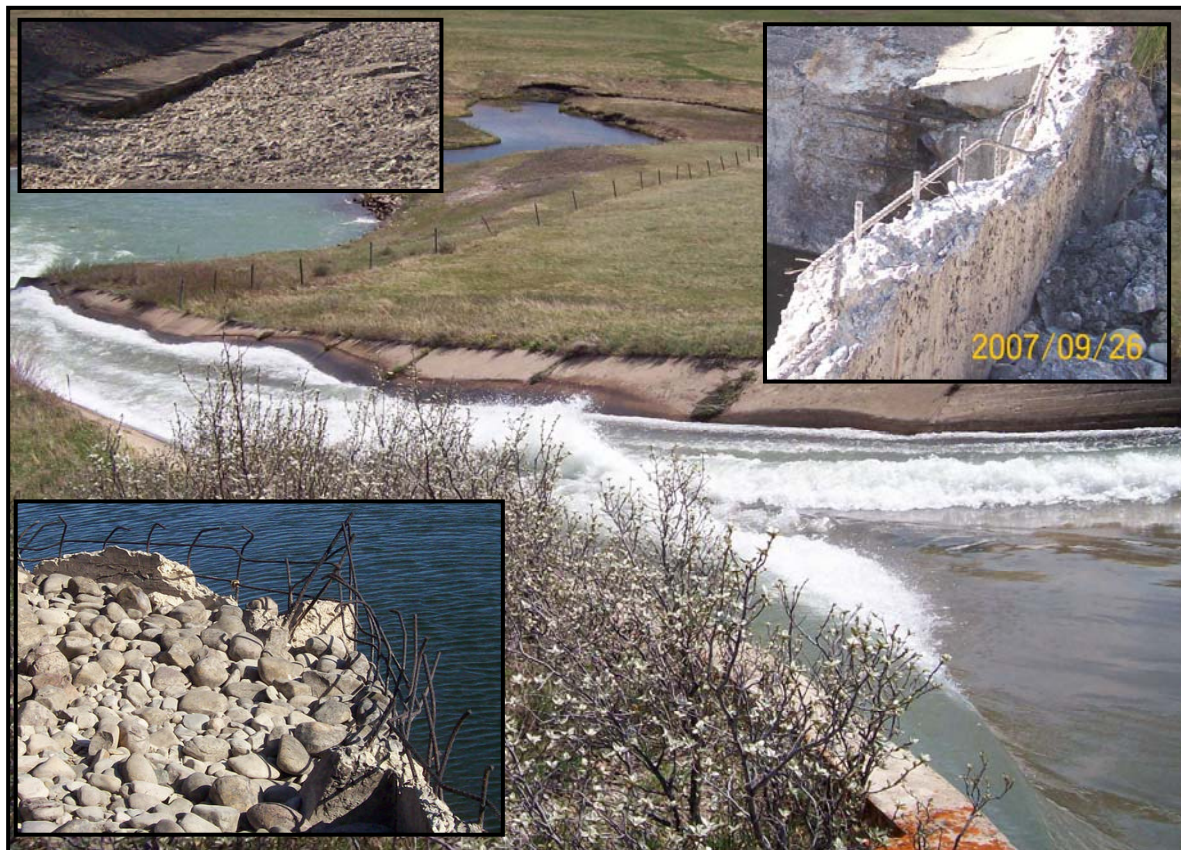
Showing infrastructure deterioration at a drop structure. Photo: John Sanders
